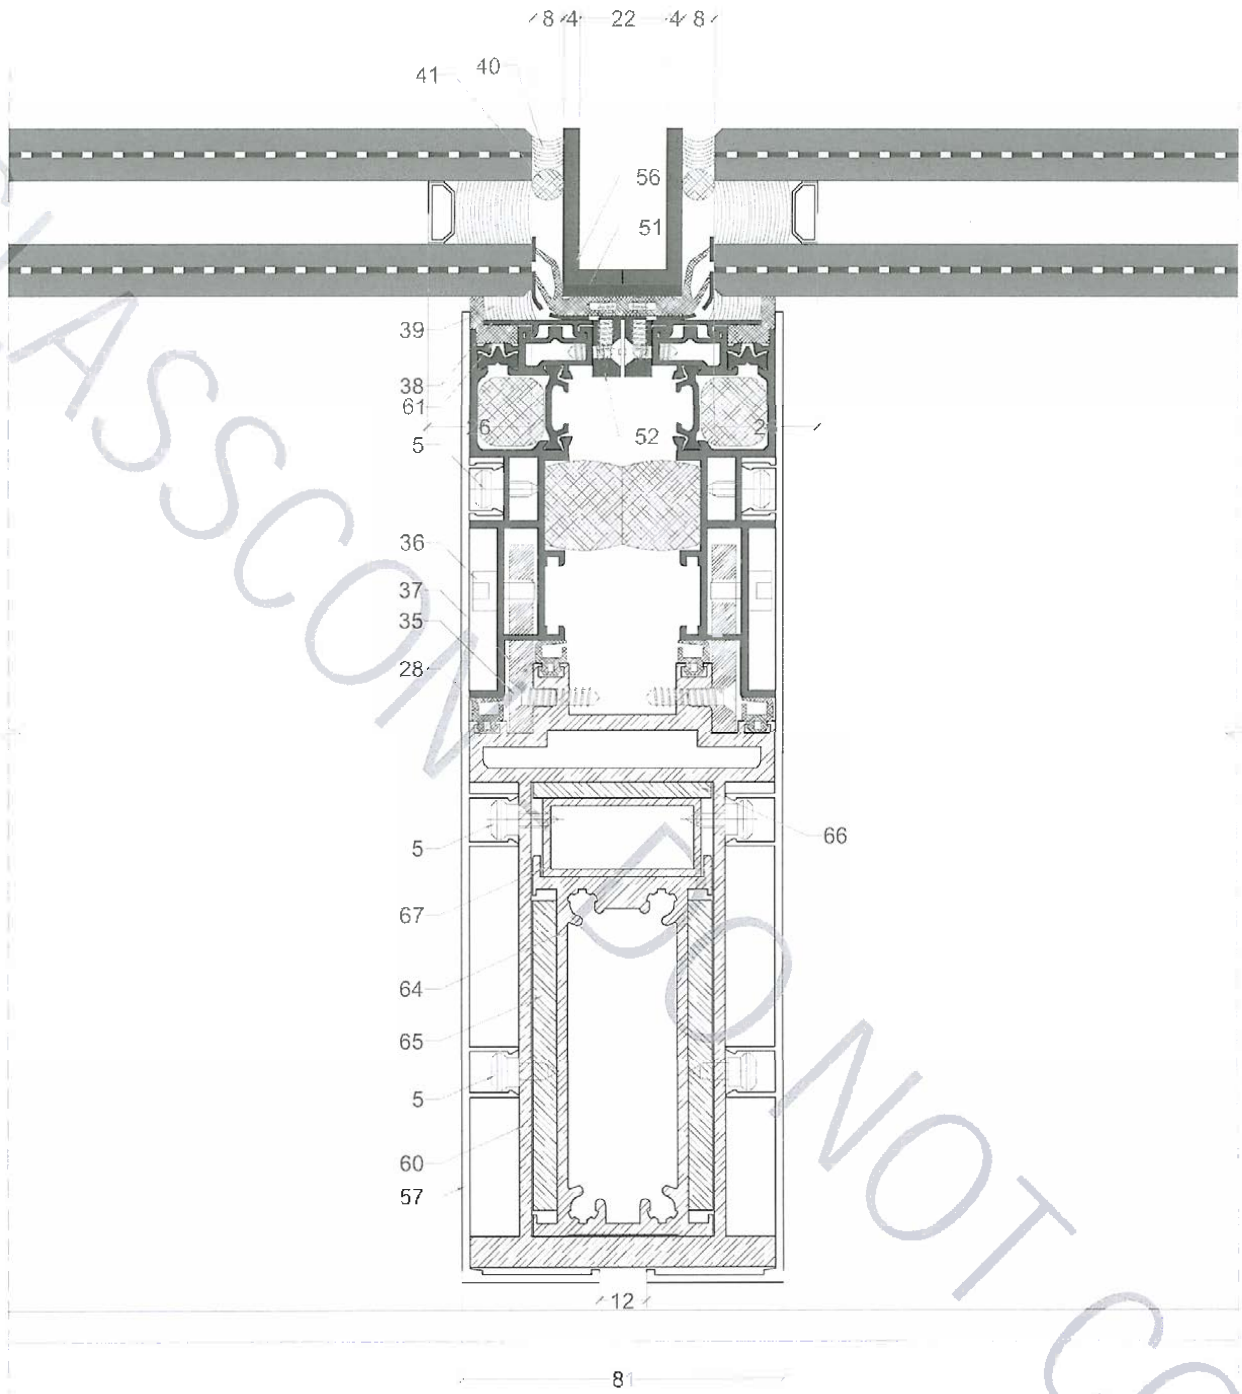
Detail of the central node of the horizontal section B-B, of the tested sample (declared nominal dimensions are expressed in mm)
